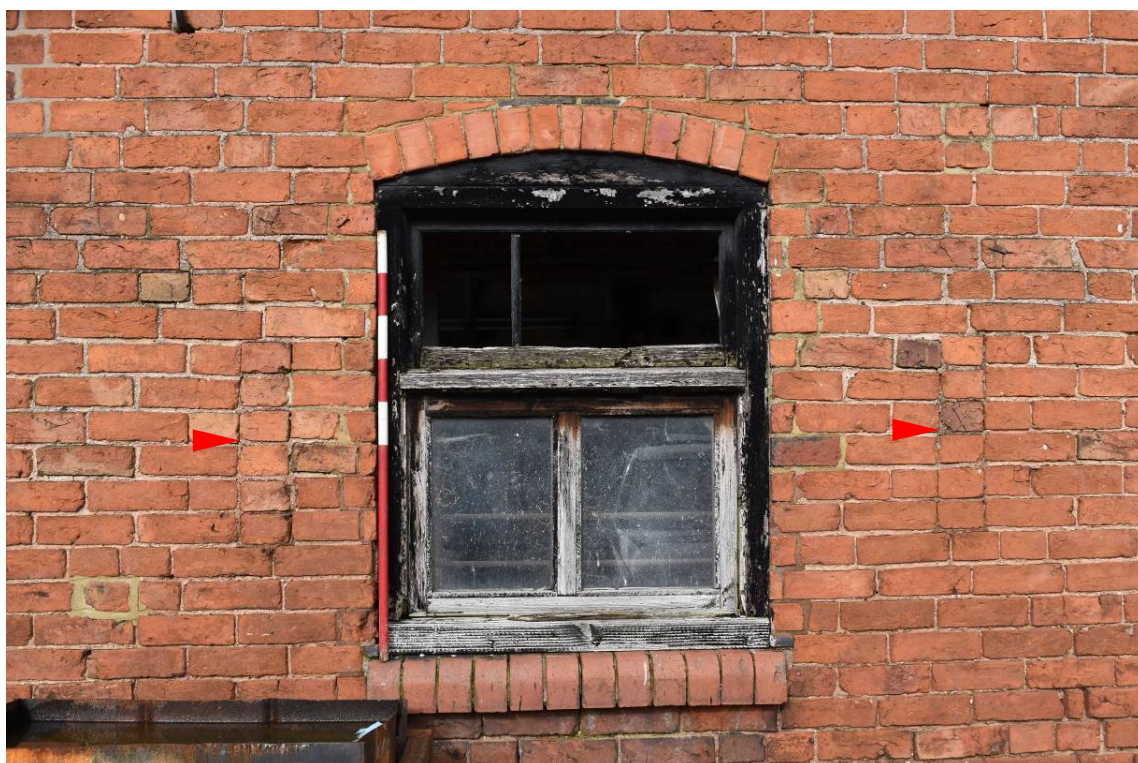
Range B, detail of window [w12] flanked by vertical vent slots (blocked, marked with arrows).
